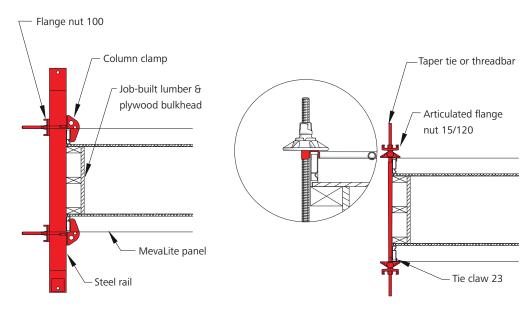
Rails & column clamps Fig. 34.2 End ties
